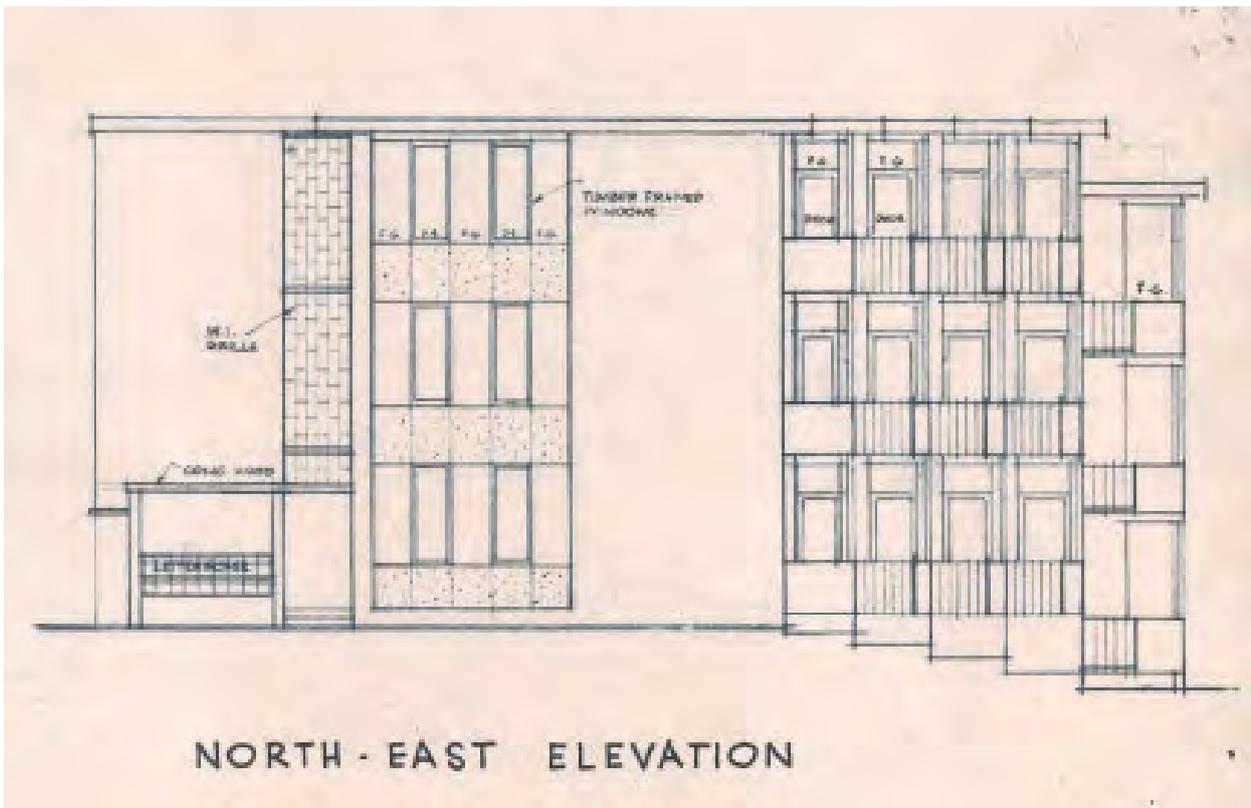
1968 drawing showing the front or north-east elevation (Source: BP)
